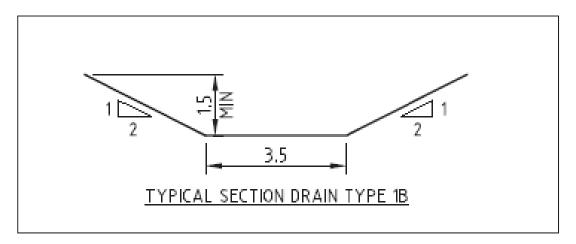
Typical cross-section of the clean water diversion drain (adapted from SKM Option 2)
